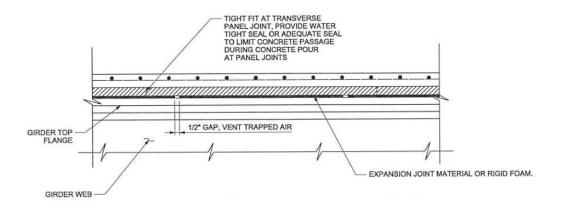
Side view of pre-cast half-deck concrete panels.
